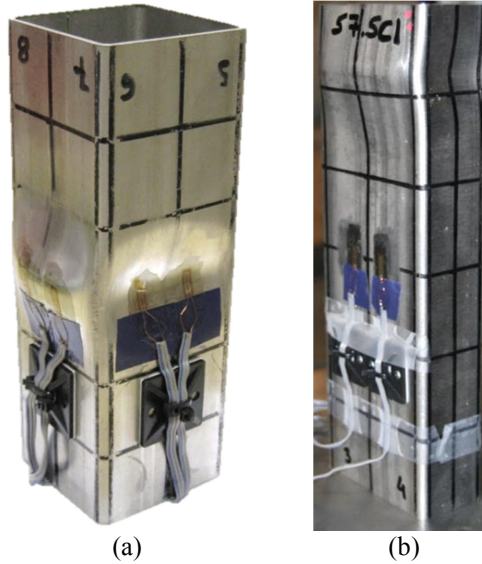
Stub column failure modes: Specimens (a) 60×60×2-SC1 and (b) 80×40×2-SC1
